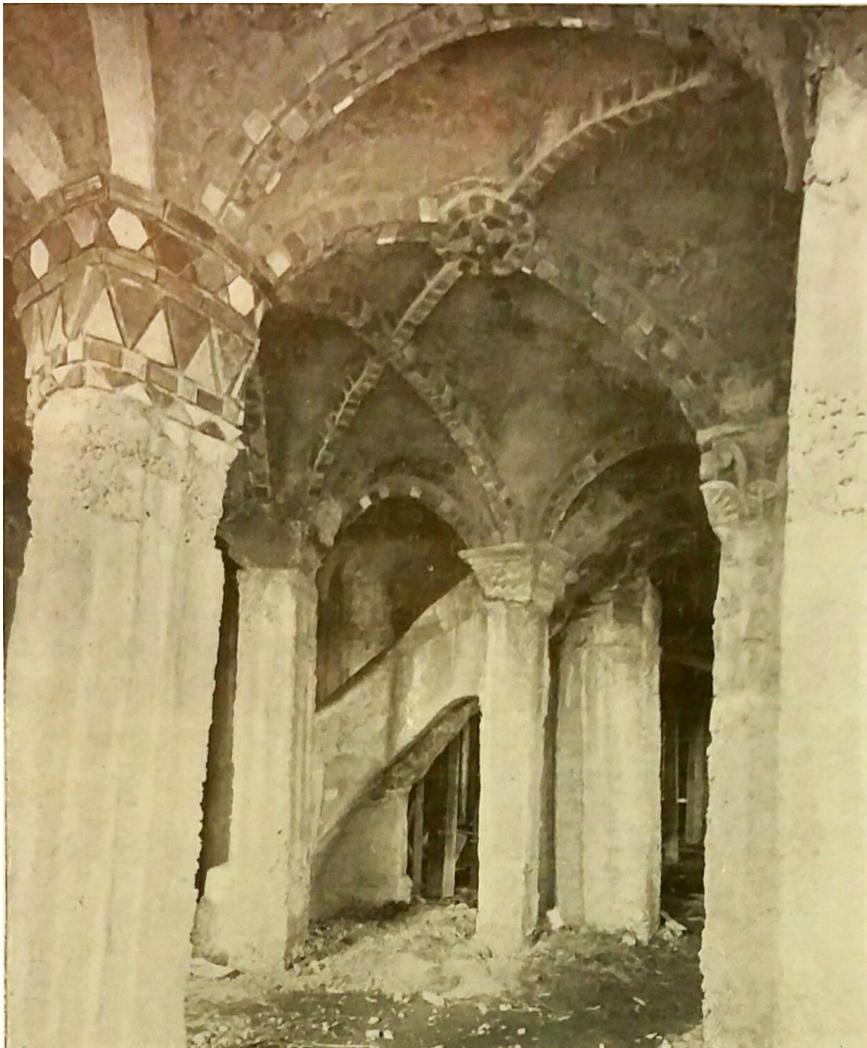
Construction photo, Fonthill, after formwork removal and before finishing. Image: "A Concrete House" Cement Age, May 1909 / public domain.
